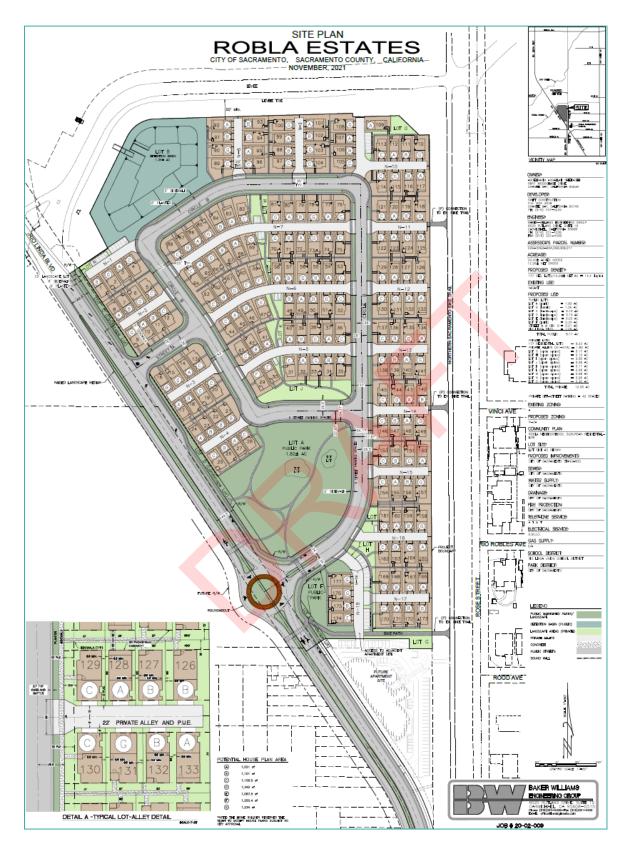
PROJECT SITE PLAN (AT BUILD-YEAR)
